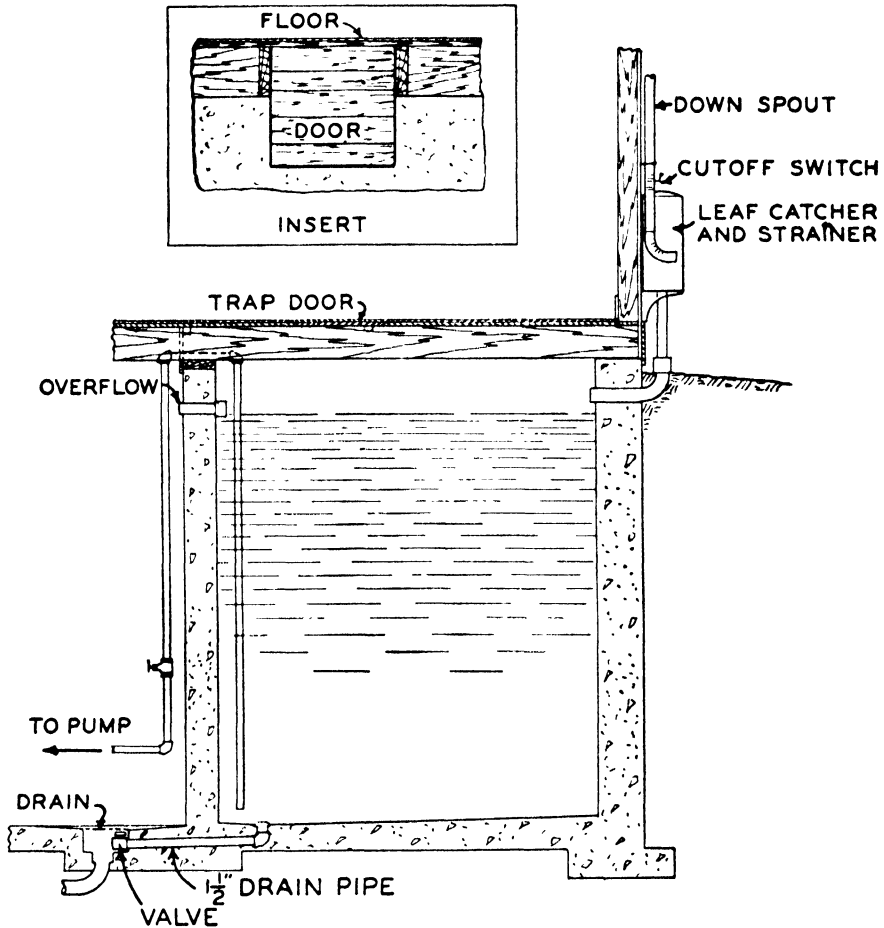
A cistern suitable for a basement. The foundation wall serves as one or more sides of the cistern, the other walls being constructed of concrete and serving as additional supports for the house. Note that the cistern is entirely enclosed to keep out dust and rodents and that a leaf catcher and strainer is provided on the down-spout. Entrance to the cistern for cleaning and repairs may be had through a trap door, as shown, or through a special door in the side between two floor sills as shown in the insert.
